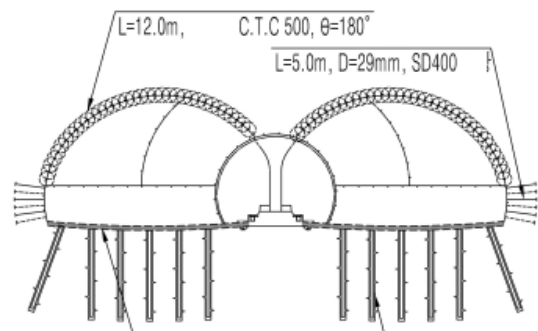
Reinforcement support pattern of 2 arch tunnel
